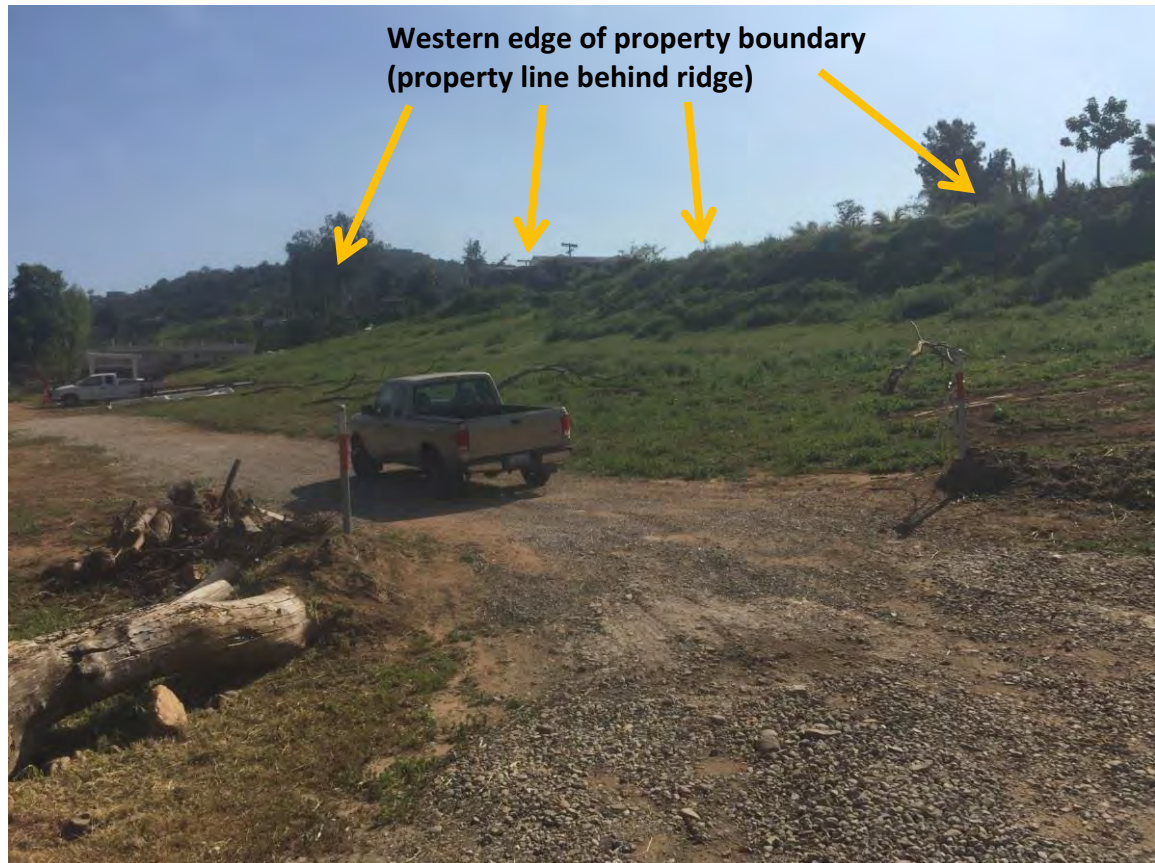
Photo from Northern Edge of Project (Retention Basin "A") – Looking Southwest
